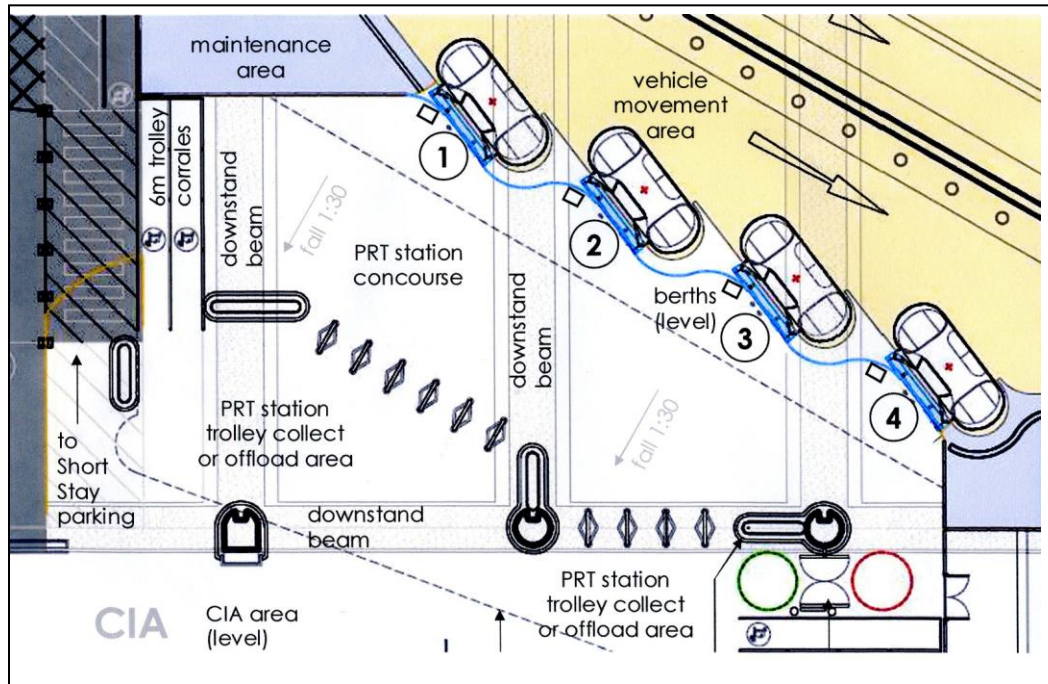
Station layout at in the Terminal 5 multi-storey car park
